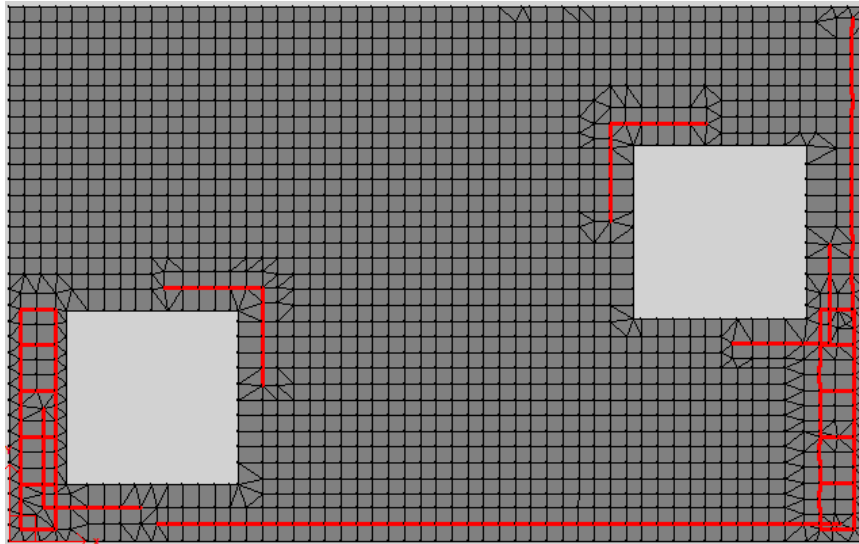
Reinforcement layout in VecTor – RC specimen
